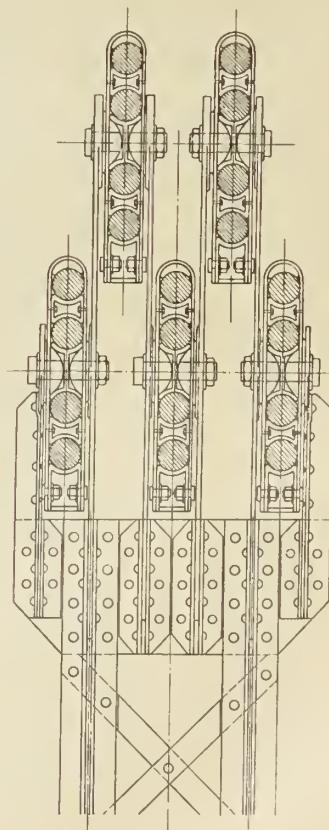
Details of bearing on top of pier (Dimensions in millimetres).
